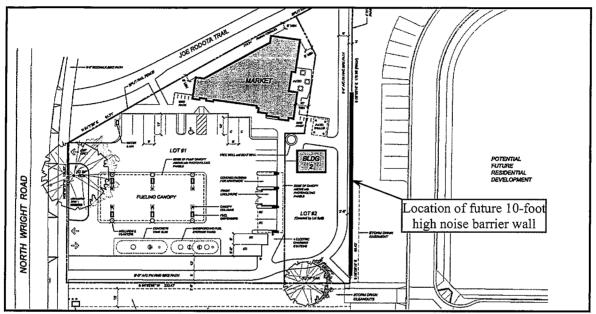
Site Plan with location of 10-foot high noise barrier wall
